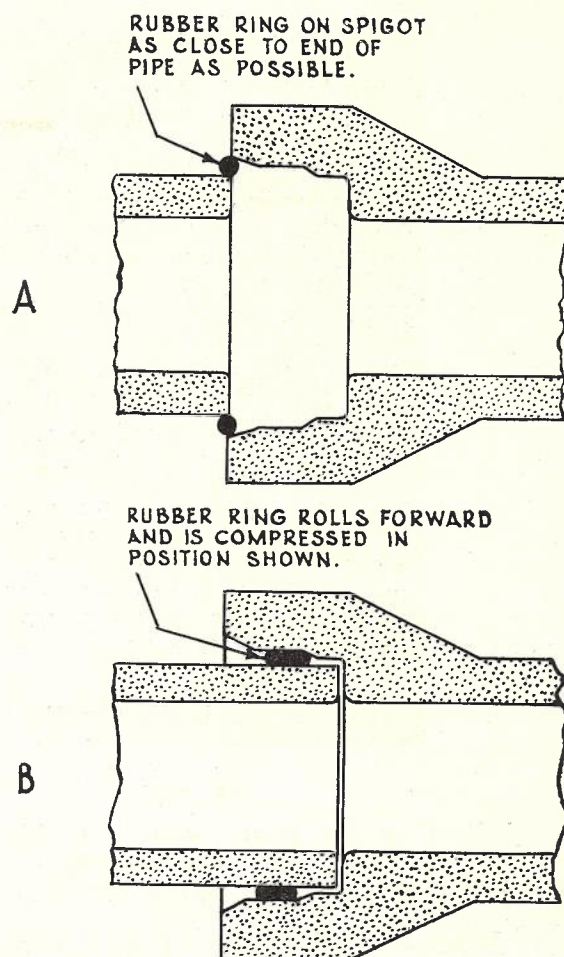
Laying of Concrete Rubber Ring Jointed Conduits. "A" shows position of ring before conduit is pushed into position. "B" shows completed joint.
